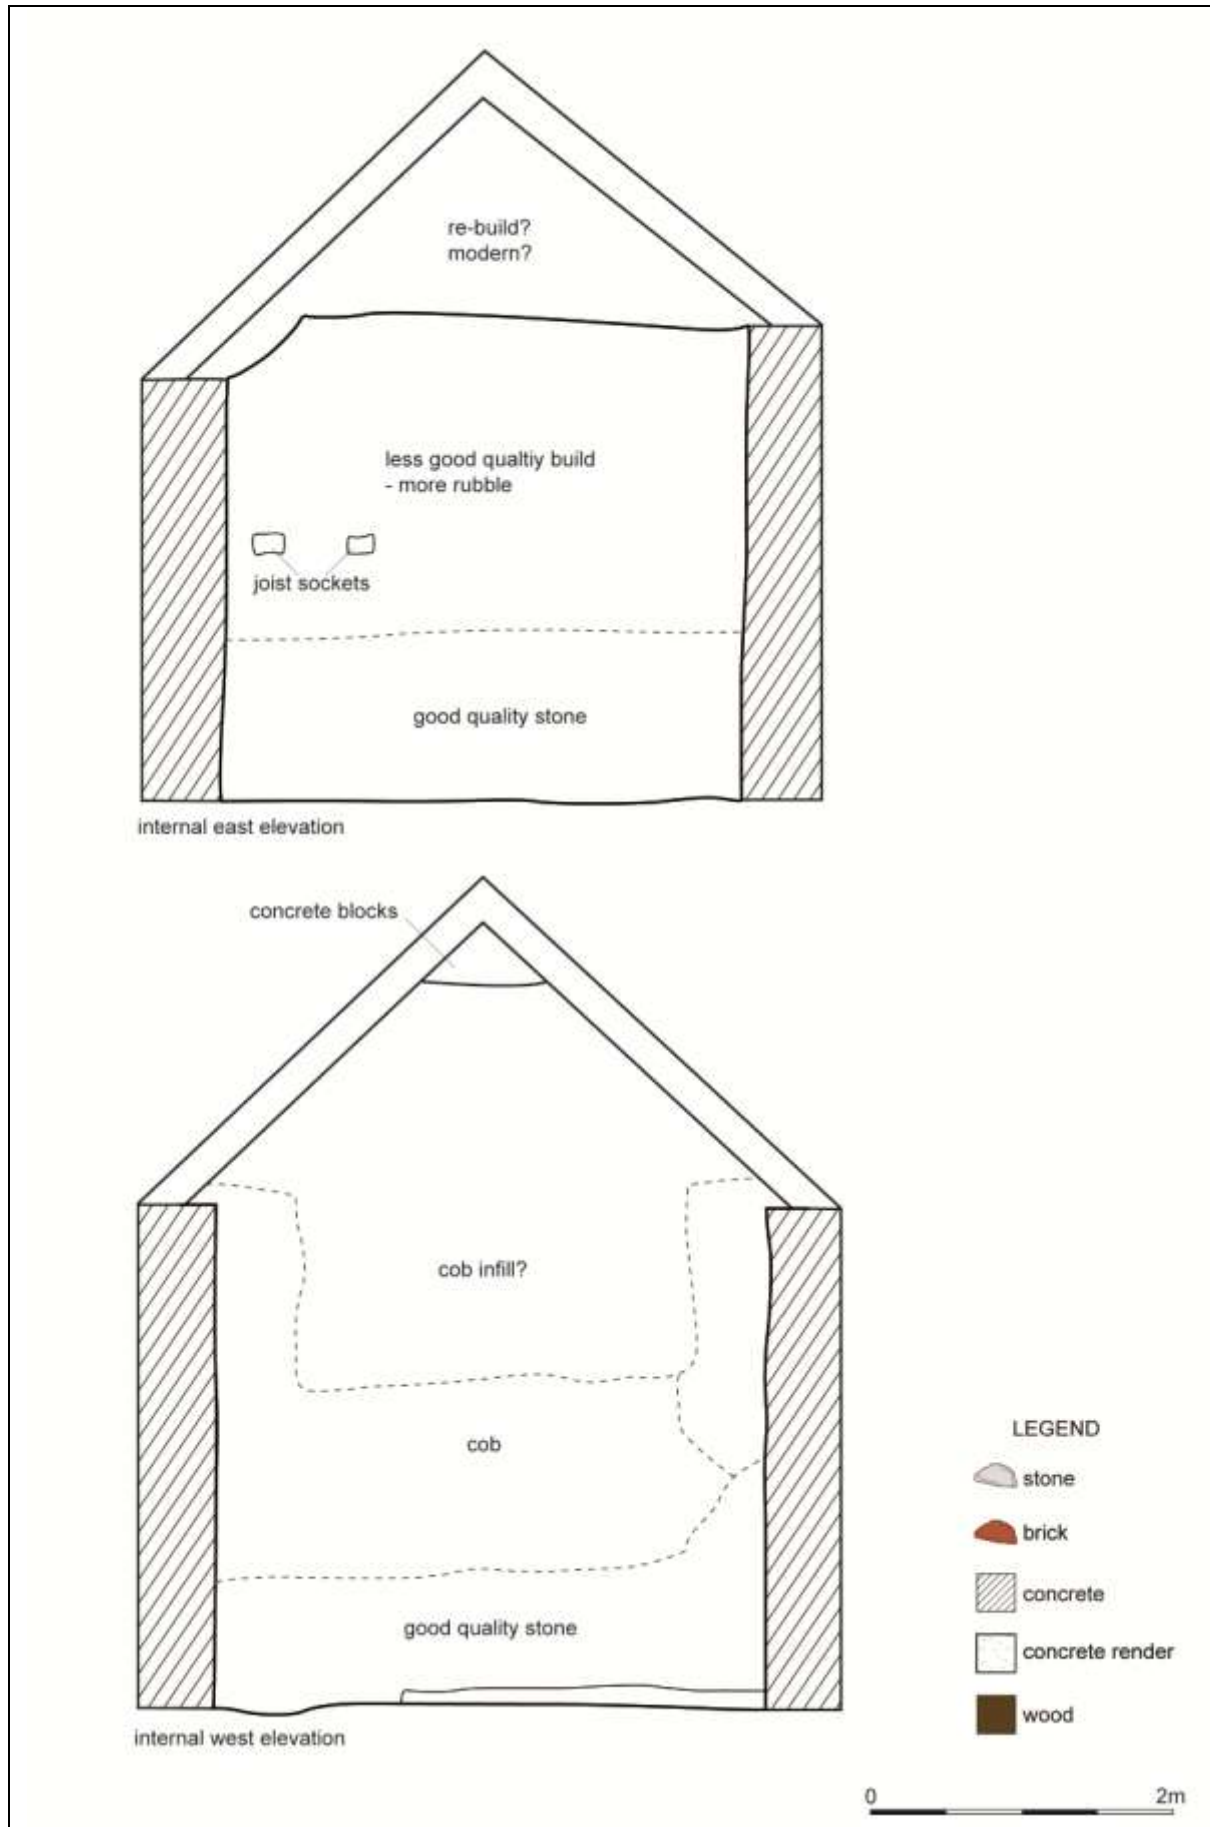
INTERNAL GABLE WALL ELEVATIONS OF B1 SHOWING DETAIL OF CONSTRUCTION.
